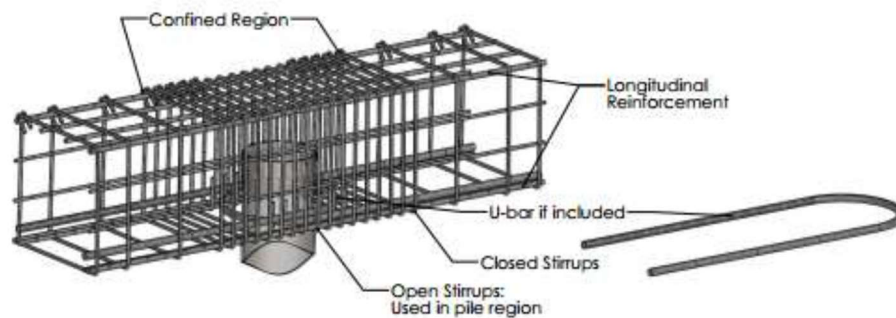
CFST to Pier Cap Connection (Kappes 2013)
